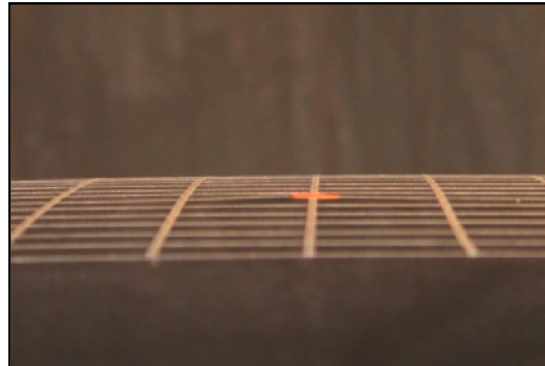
Post Test Damage, Test 5b – Roof Panel Impact
